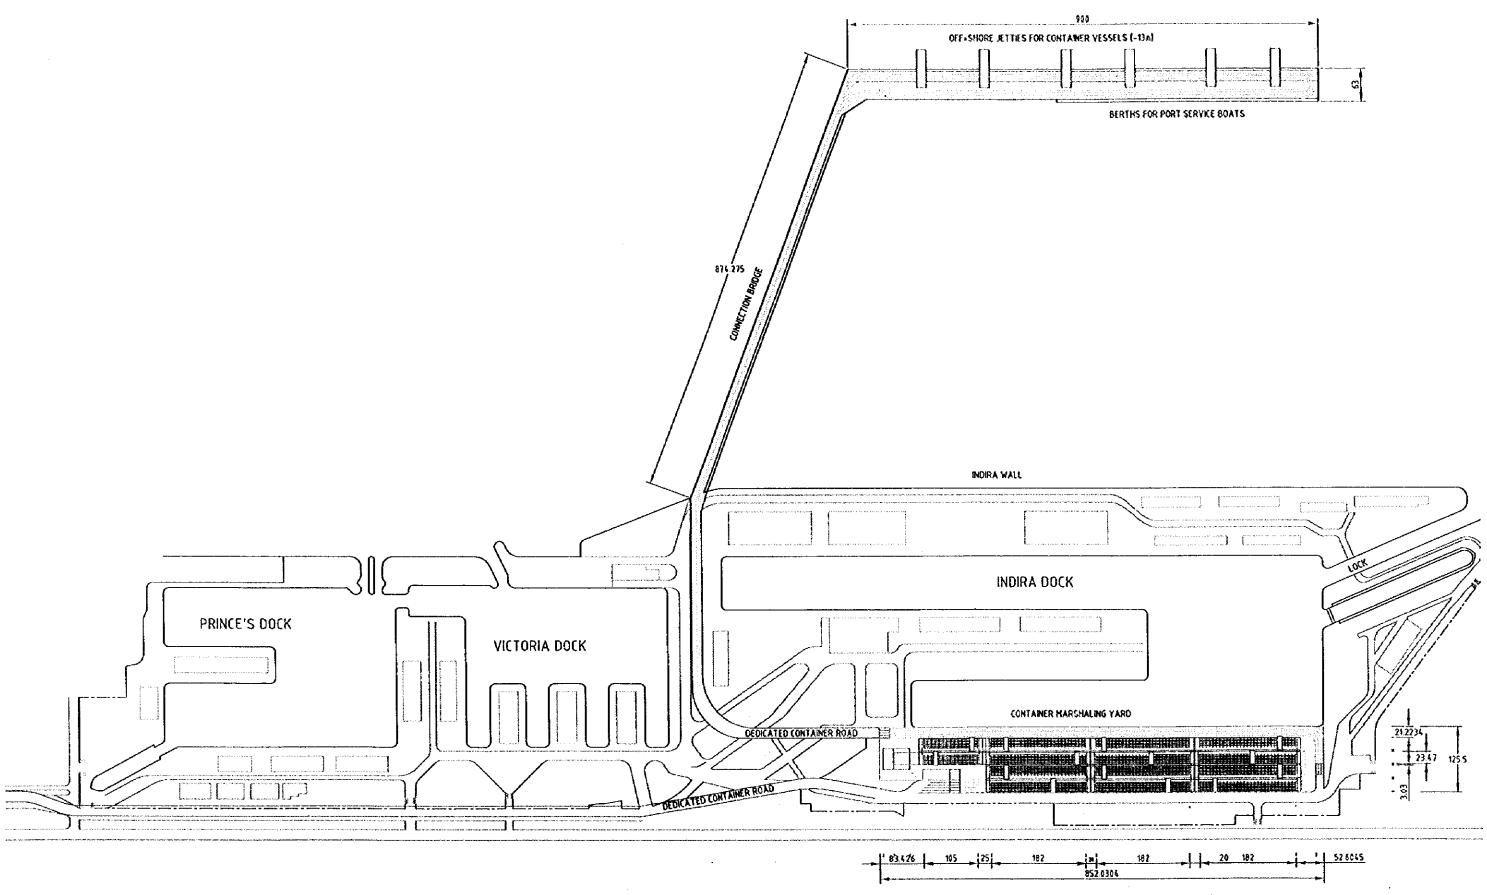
(2) LAYOUT PLAN OF A NEW CONTAINER TERMINAL AT ID2-ID6 (ALTERNATIVE-5)
